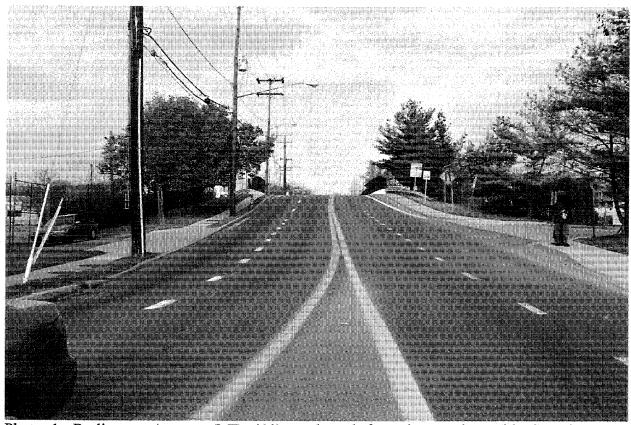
Burlington Avenue (MD 410) eastbound from intersection with Georgia Avenue.
